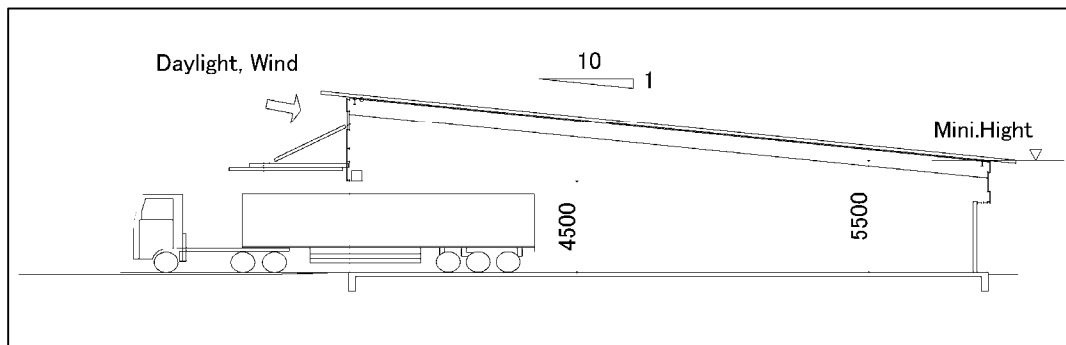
Floor height of General Cargo Warehouse in the Project
